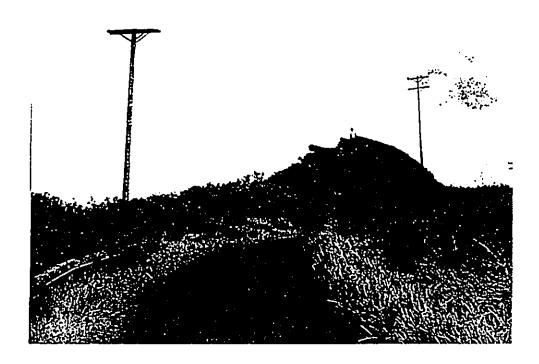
Proposed Access Road and Existing Nike Road Intersection, View to NW
